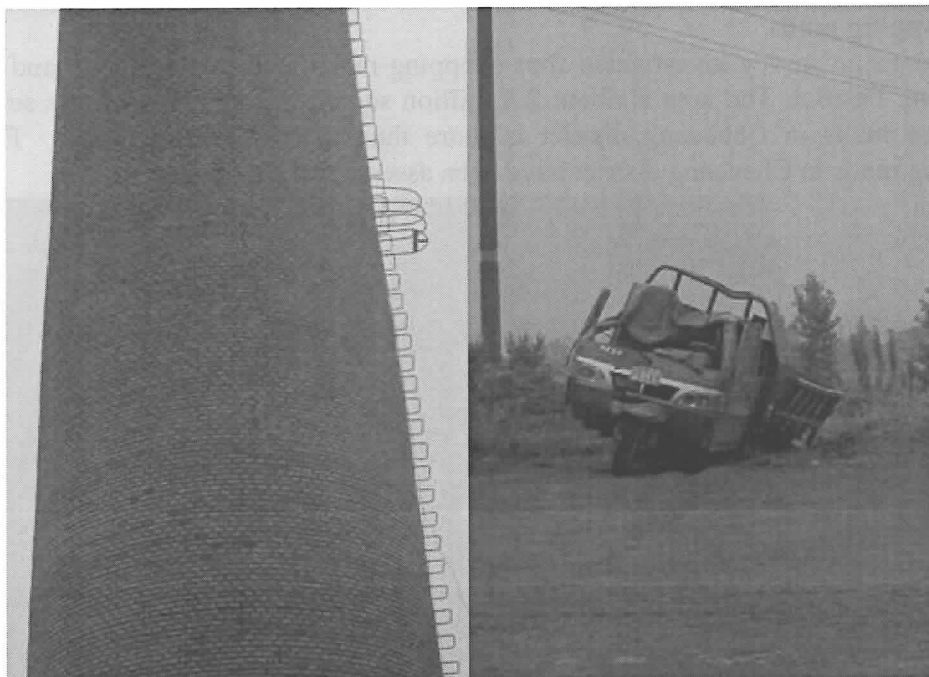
Brickfield masonry structure chimney is 58 meters high. 15 meters long at the top fell down and damage the tractor parting beside it. Remainder has vertical permeability cracks of 20 meters long from the top.
